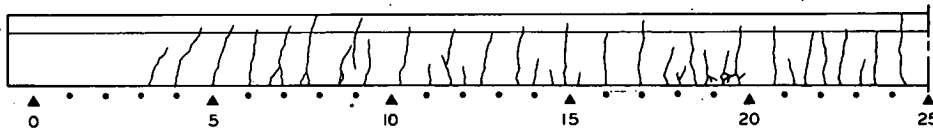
Crack patterns on reinforced concrete beams.
